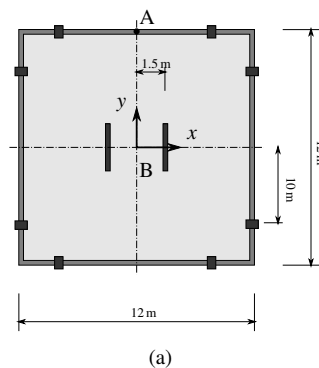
Four, eight and twelve-storey buildings plan geometry.
